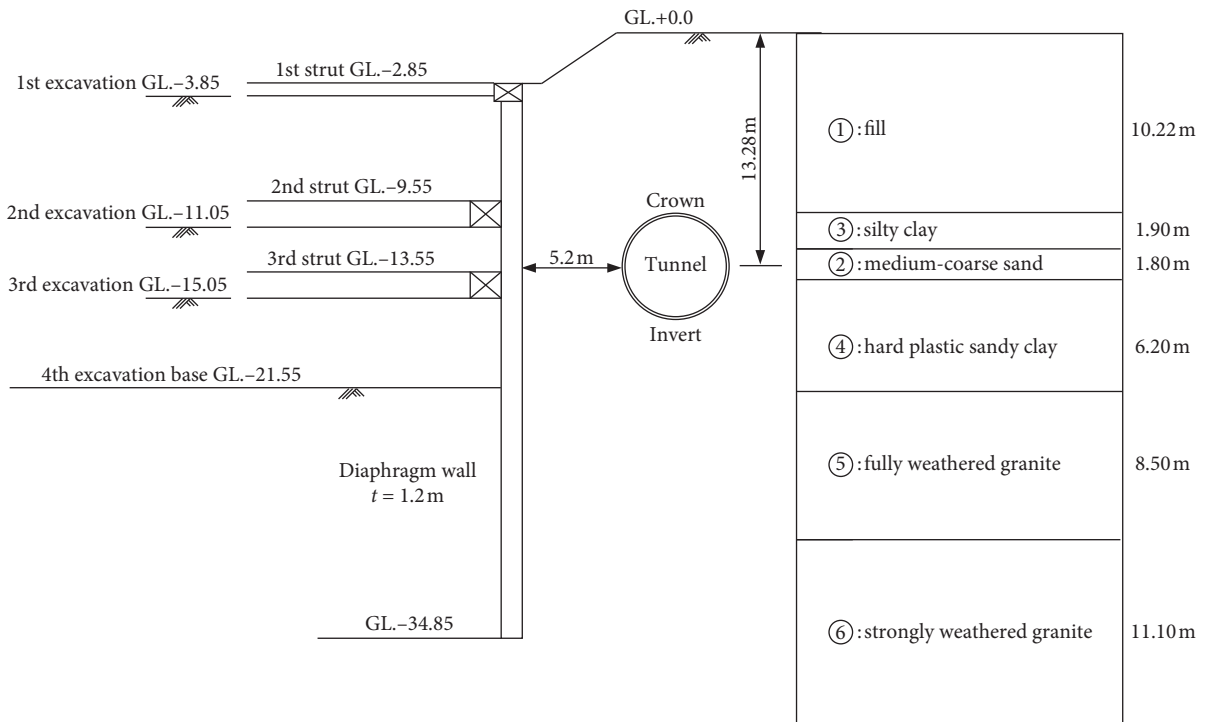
Profile of soil layer, excavation, and tunnel (section A-A).
